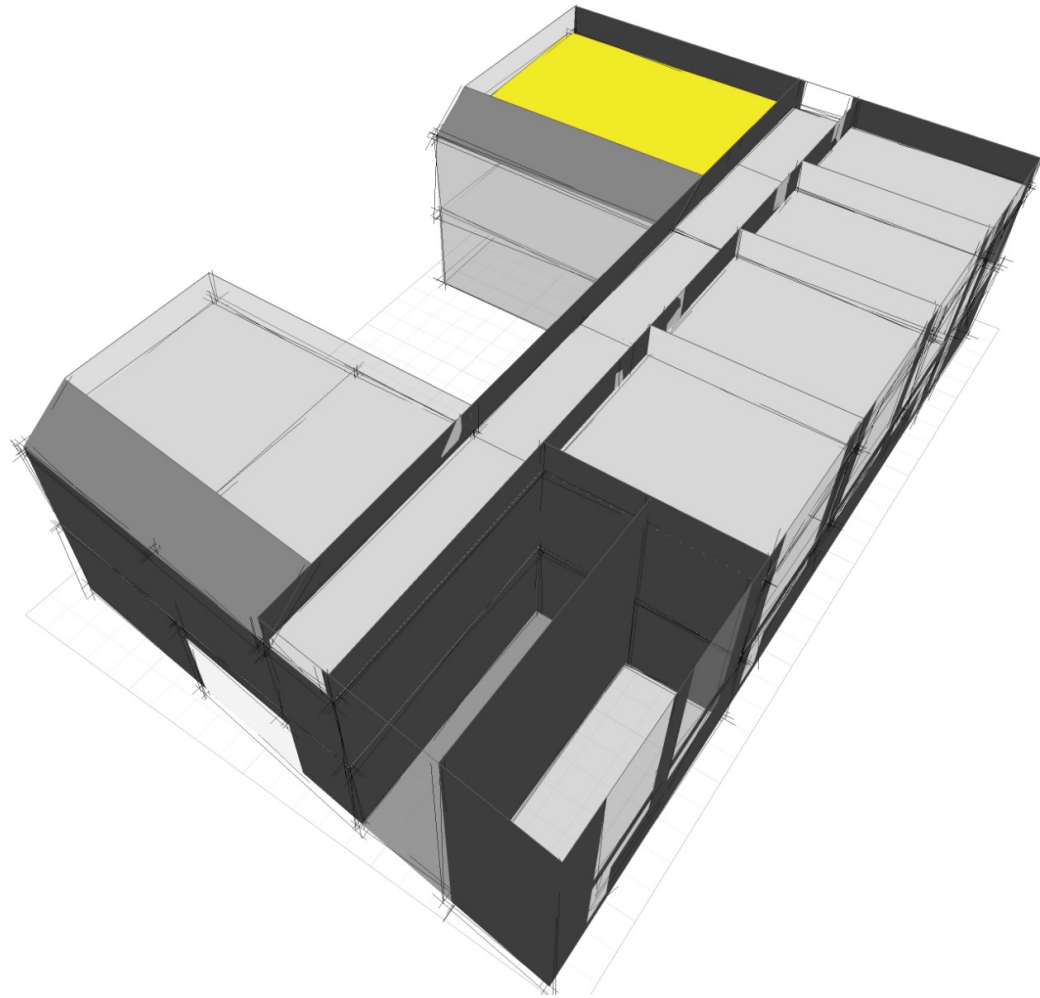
Apartment with Glass Facade Area, Second Floor
